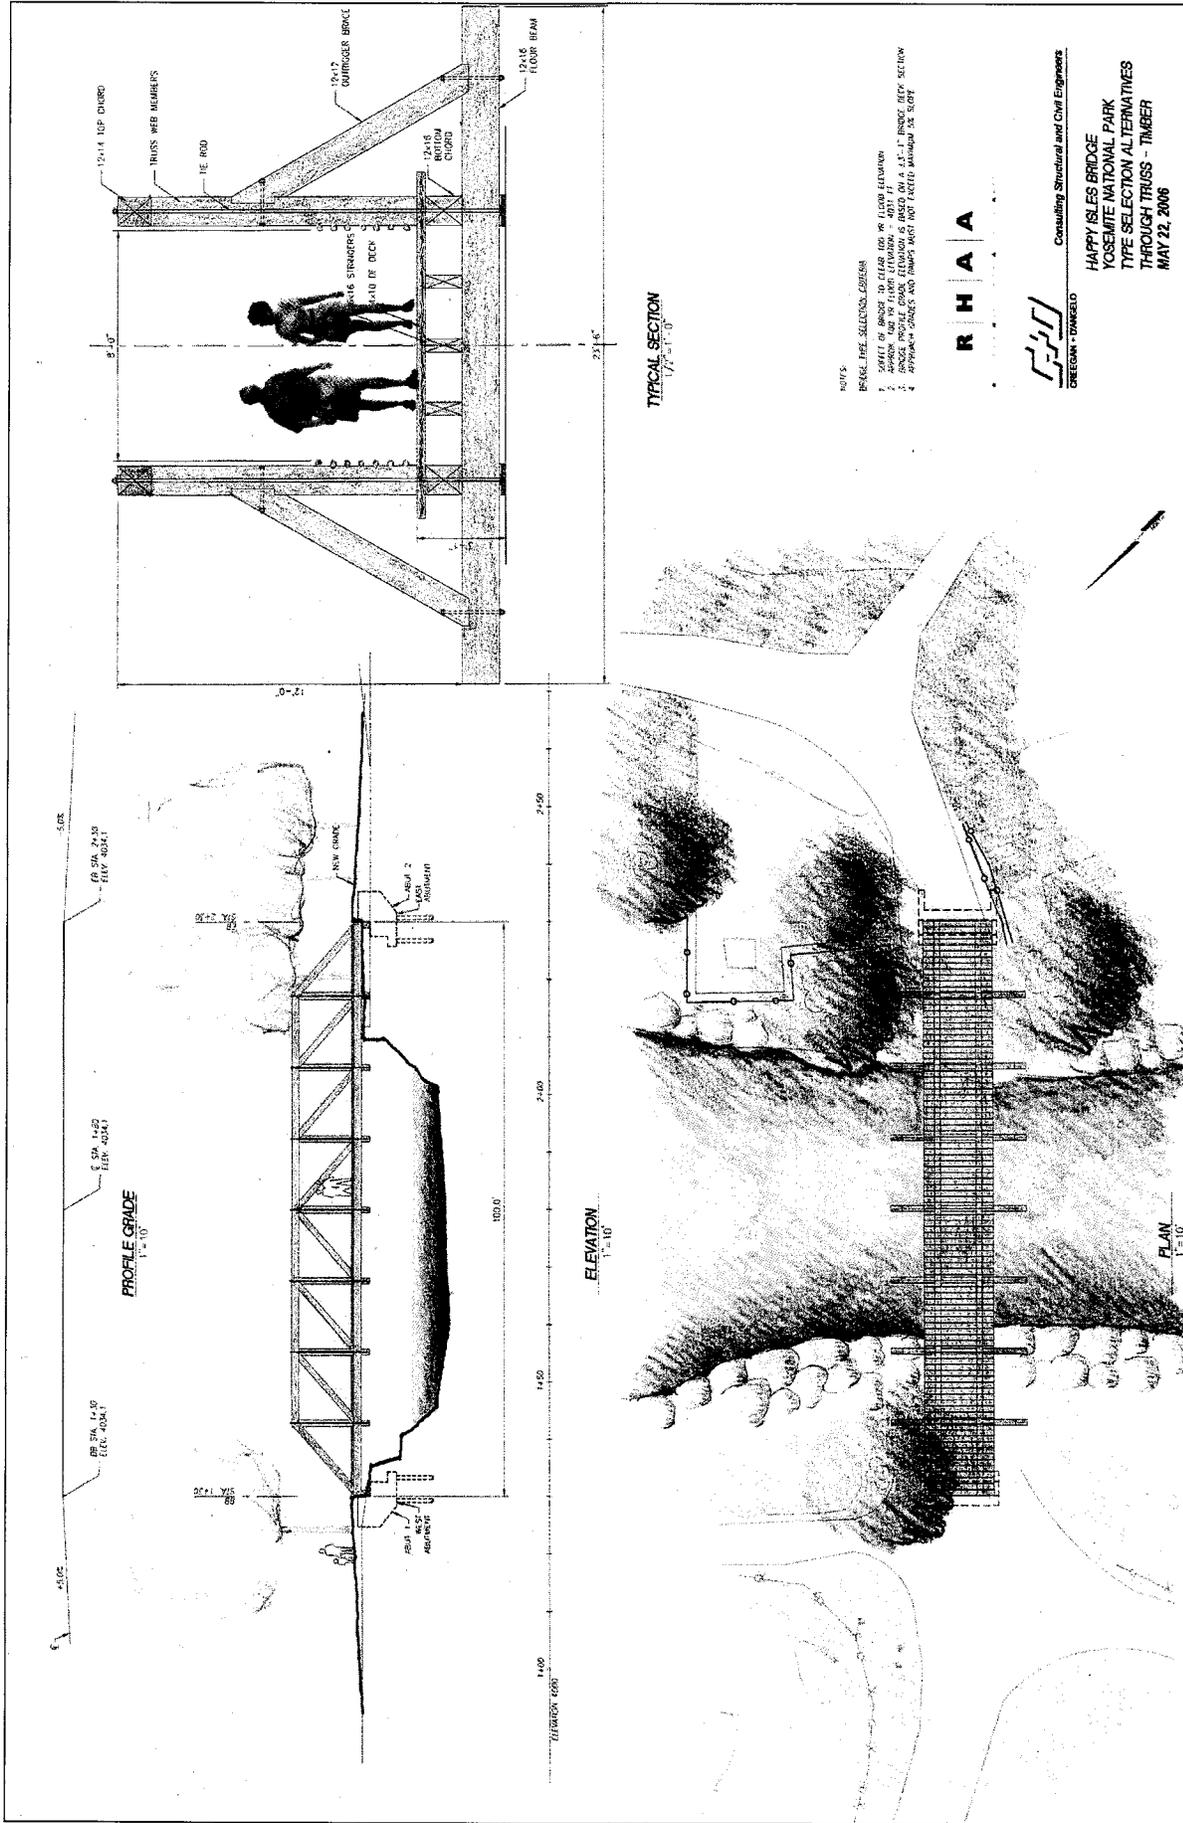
Wood Truss Bridge: profile grade, elevation, plan, and typical section drawings
